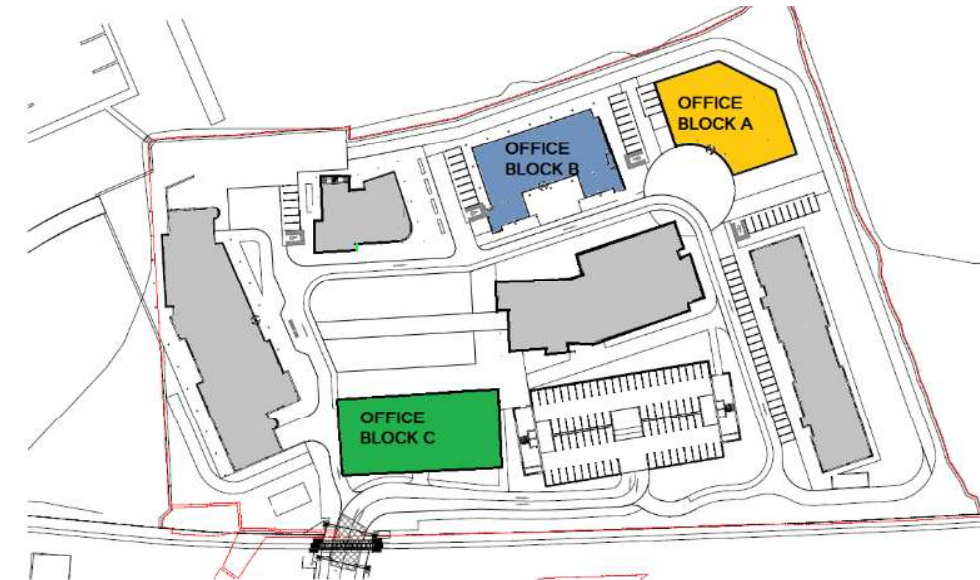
Site Key Plan Indicating the Office Building Locations
